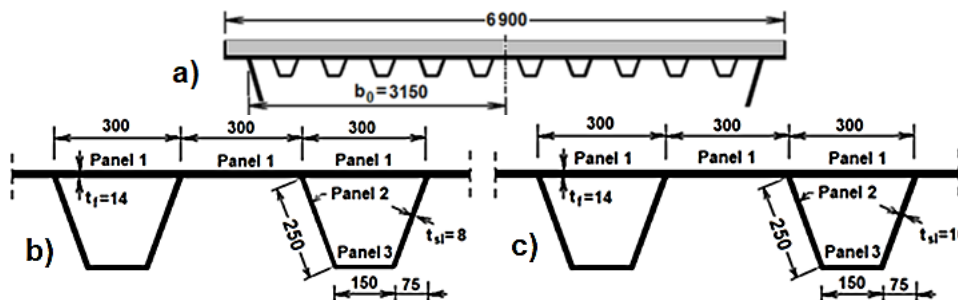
Girder with an orthotropic deck: a) cross-section of the deck; b) details orthotropic deck for  $t_{sl} = 8\text{mm}$ ; c) details orthotropic deck for  $t_{sl} = 10\text{mm}$
